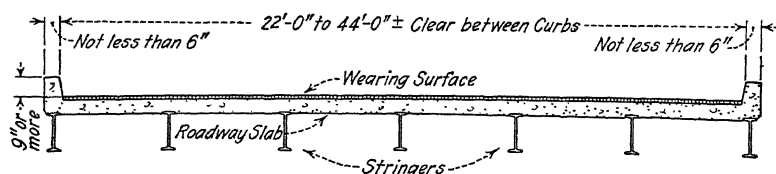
Cross Section of Typical Highway-Bridge Floor with Concrete Deck.
